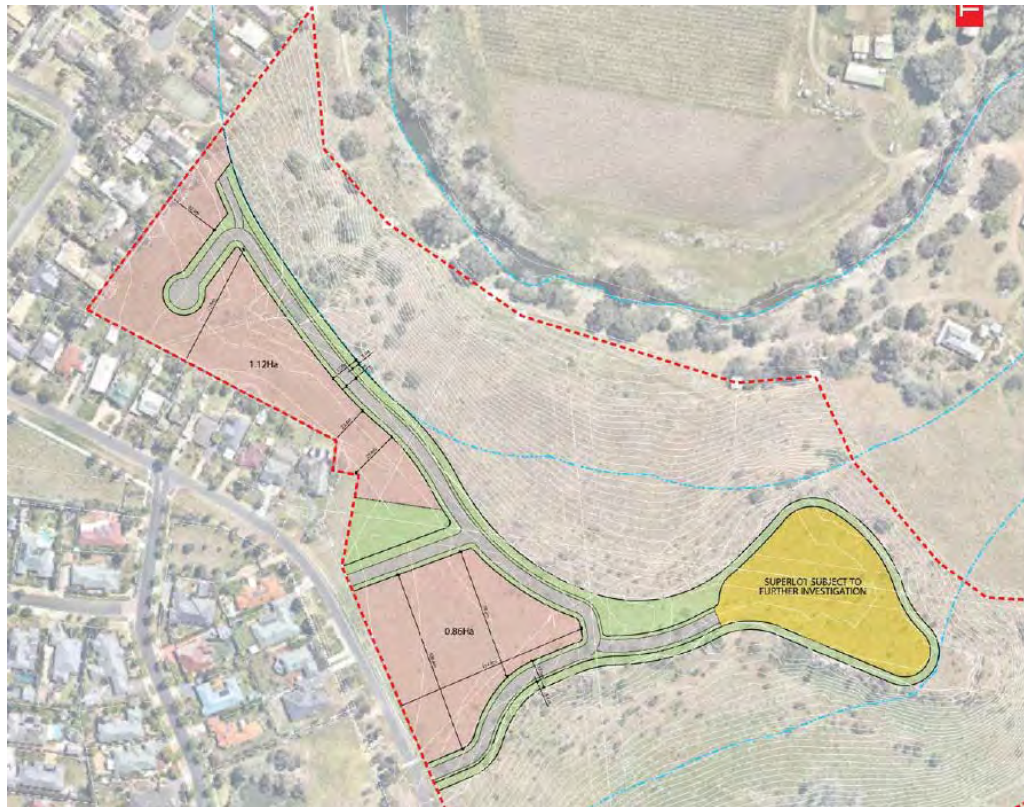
Harker Street Residential Concept Plan (Figure 2 Sunbury South PSP – November 2016)
